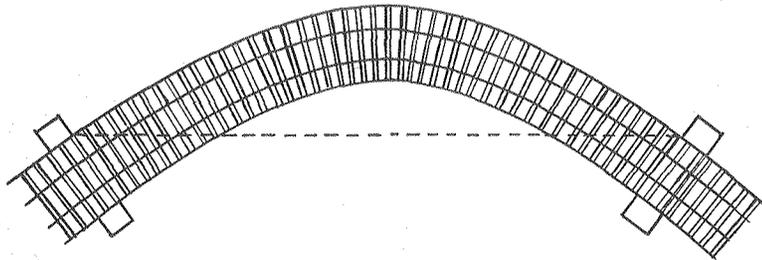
Ground Plan of a Curved Truss Supported by Only Two Abutments.
